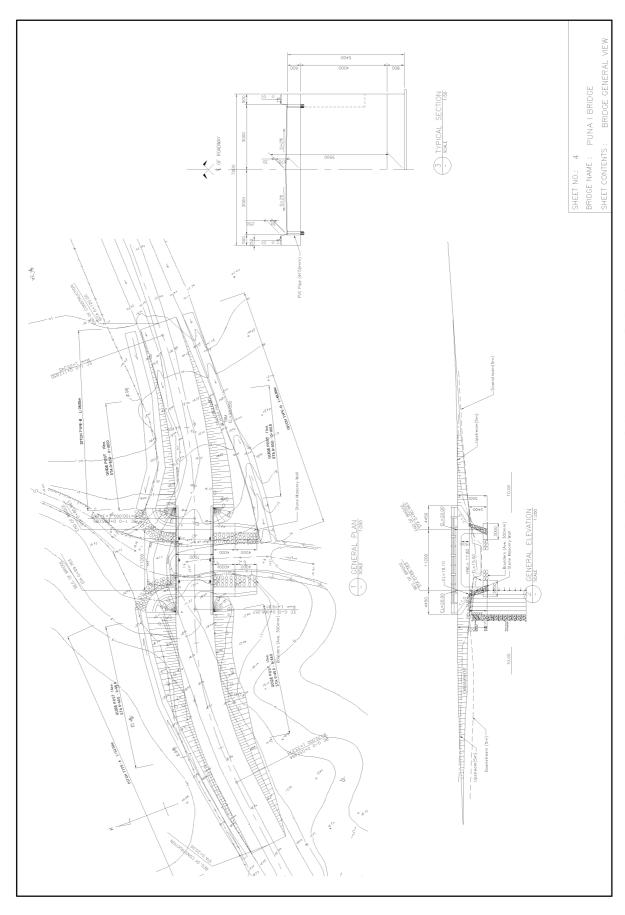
Bridge General View of Puna I Bridge
